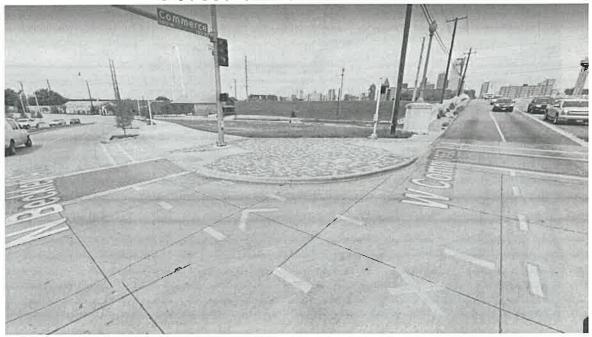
Northeast Corner of Commerce Street and Beckley Avenue
